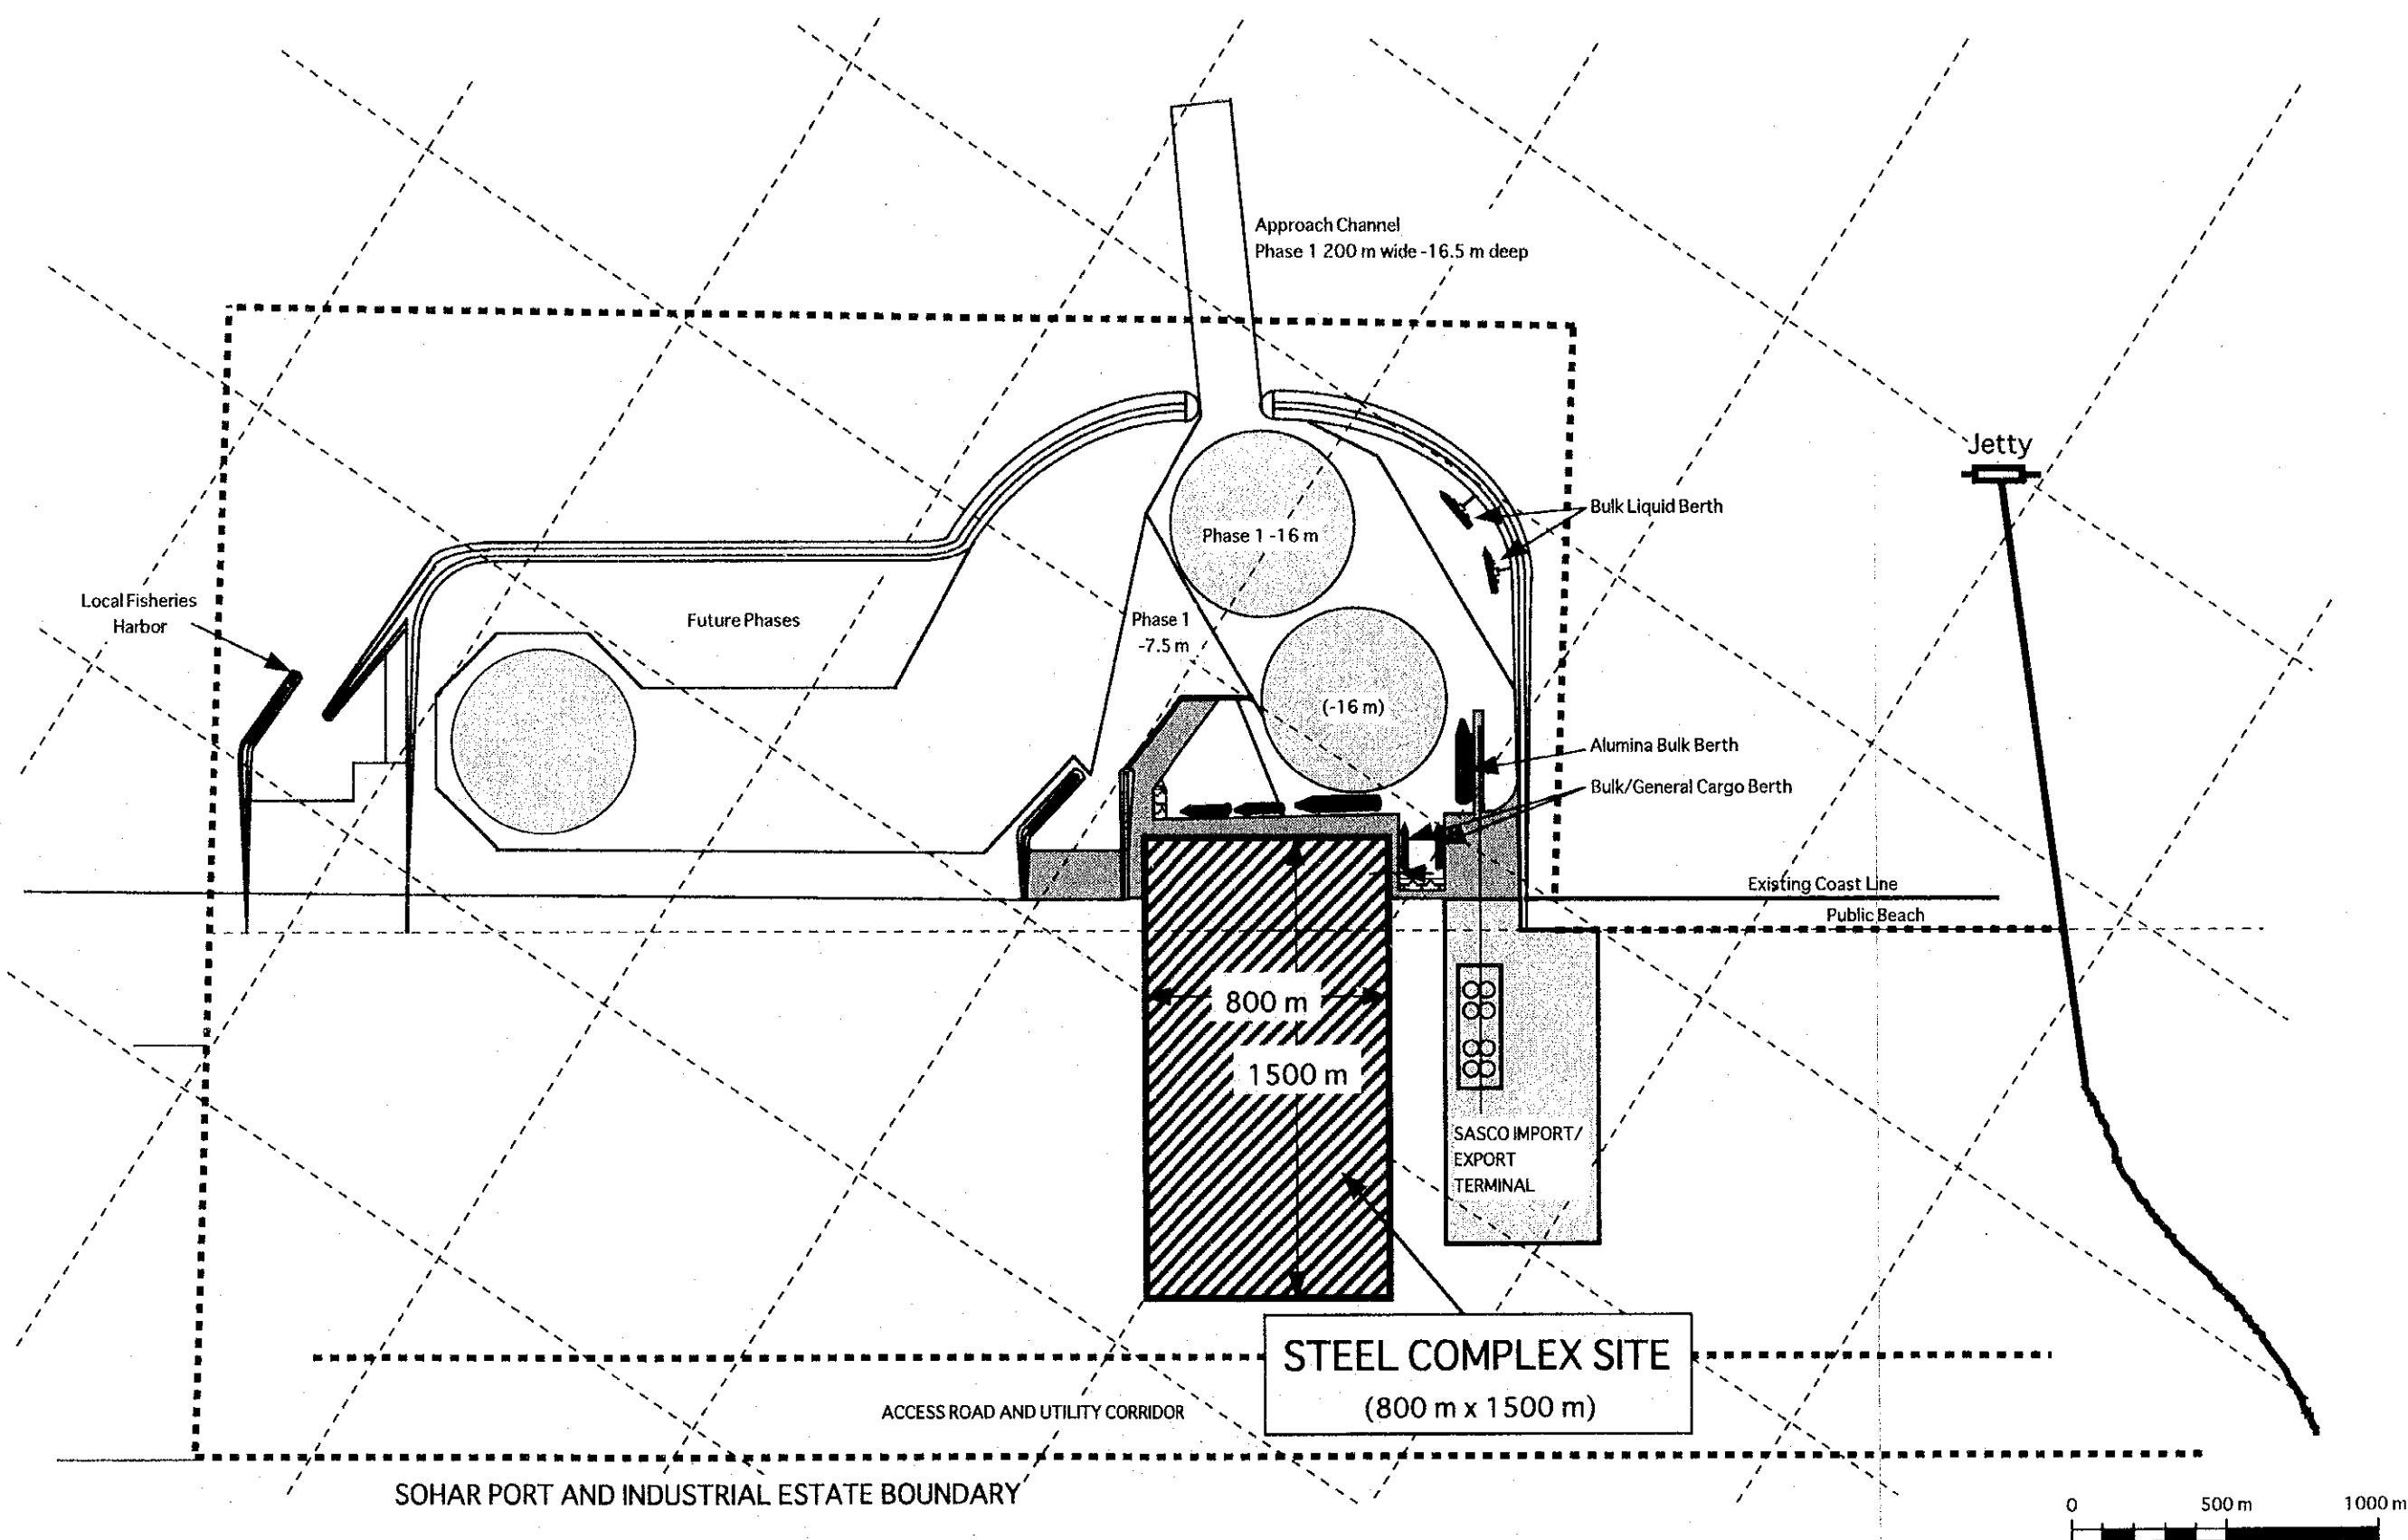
Sohar New Port Plan and the Steel Complex Site
